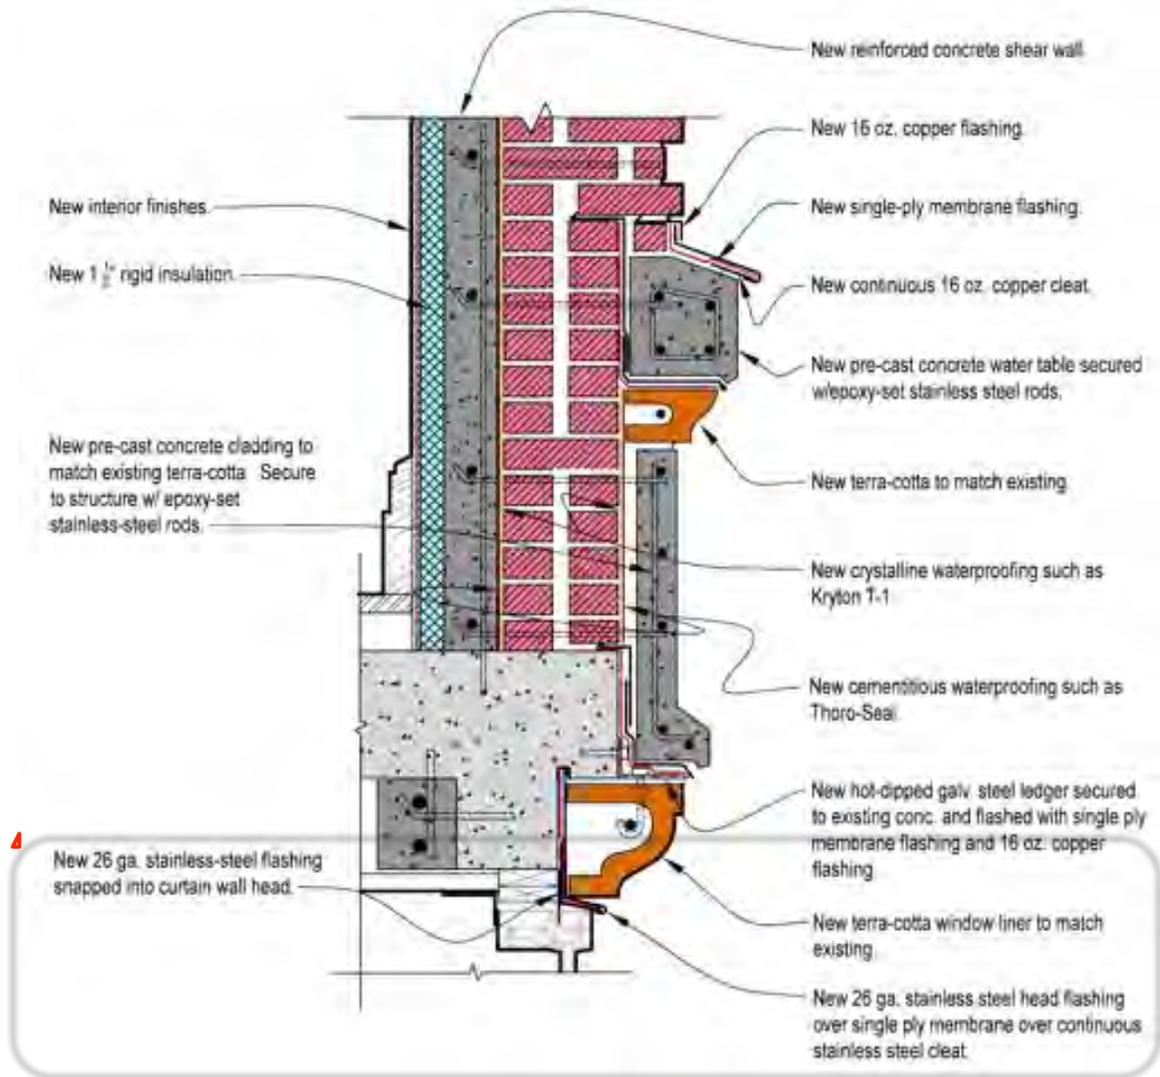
(3): Window Head Installation at Level 4 “Public” Façade Locations
